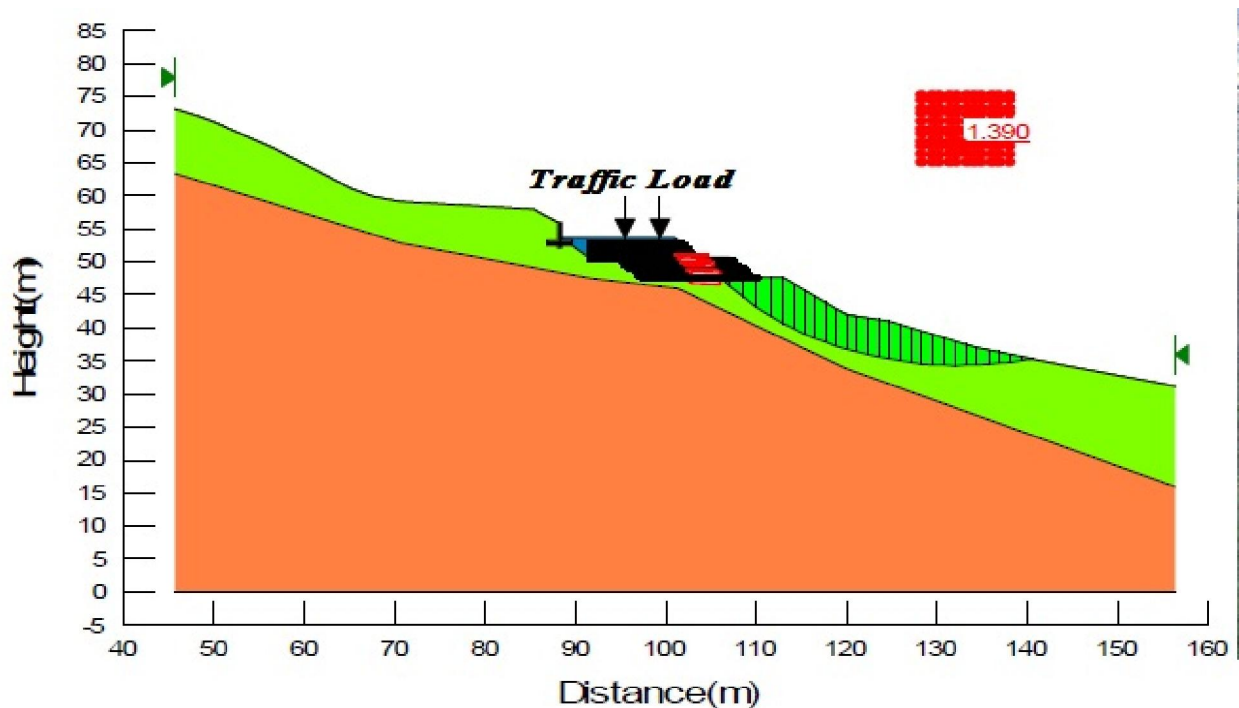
Slope stability in A-A cross section in option 2 after sliding stabilization (static mode)
